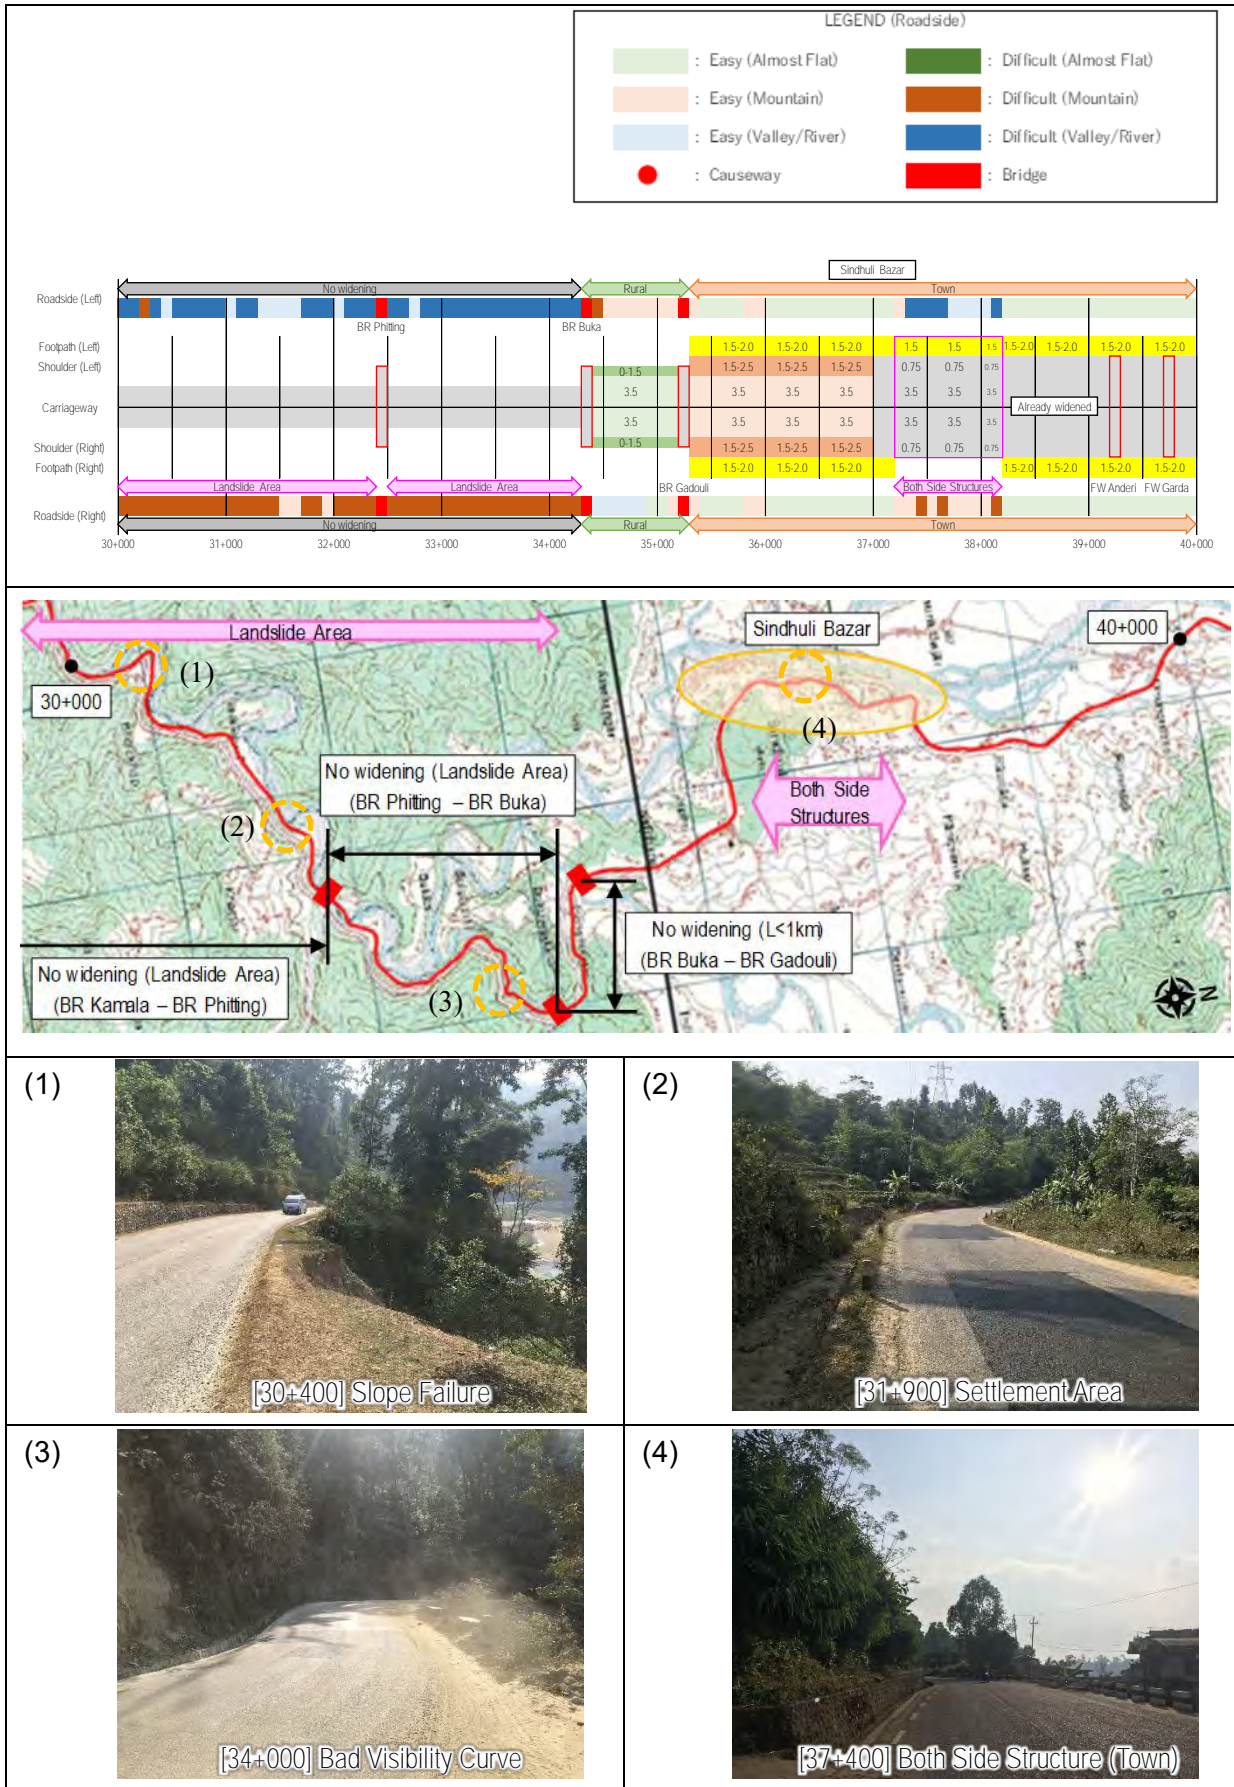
Example of Application of Cross Section Type (Ch.30-40km)
